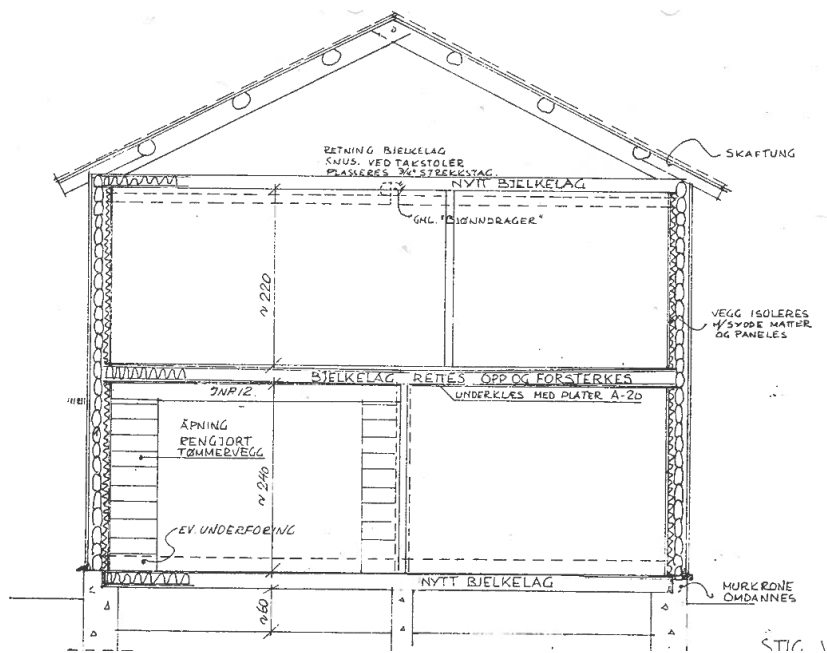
Sjøgata 41, elevation showing the proposed reconstruction of the floors to increase indoor heights, and thermal insulation. The removal of the old tier of joists between the upstairs and loft level was advised against by *Riksantikvaren* and not carried out. (Bjørn Grimsby Arkitekt M.N.A.L 29.3.78, Vefsn municipal building archive)
